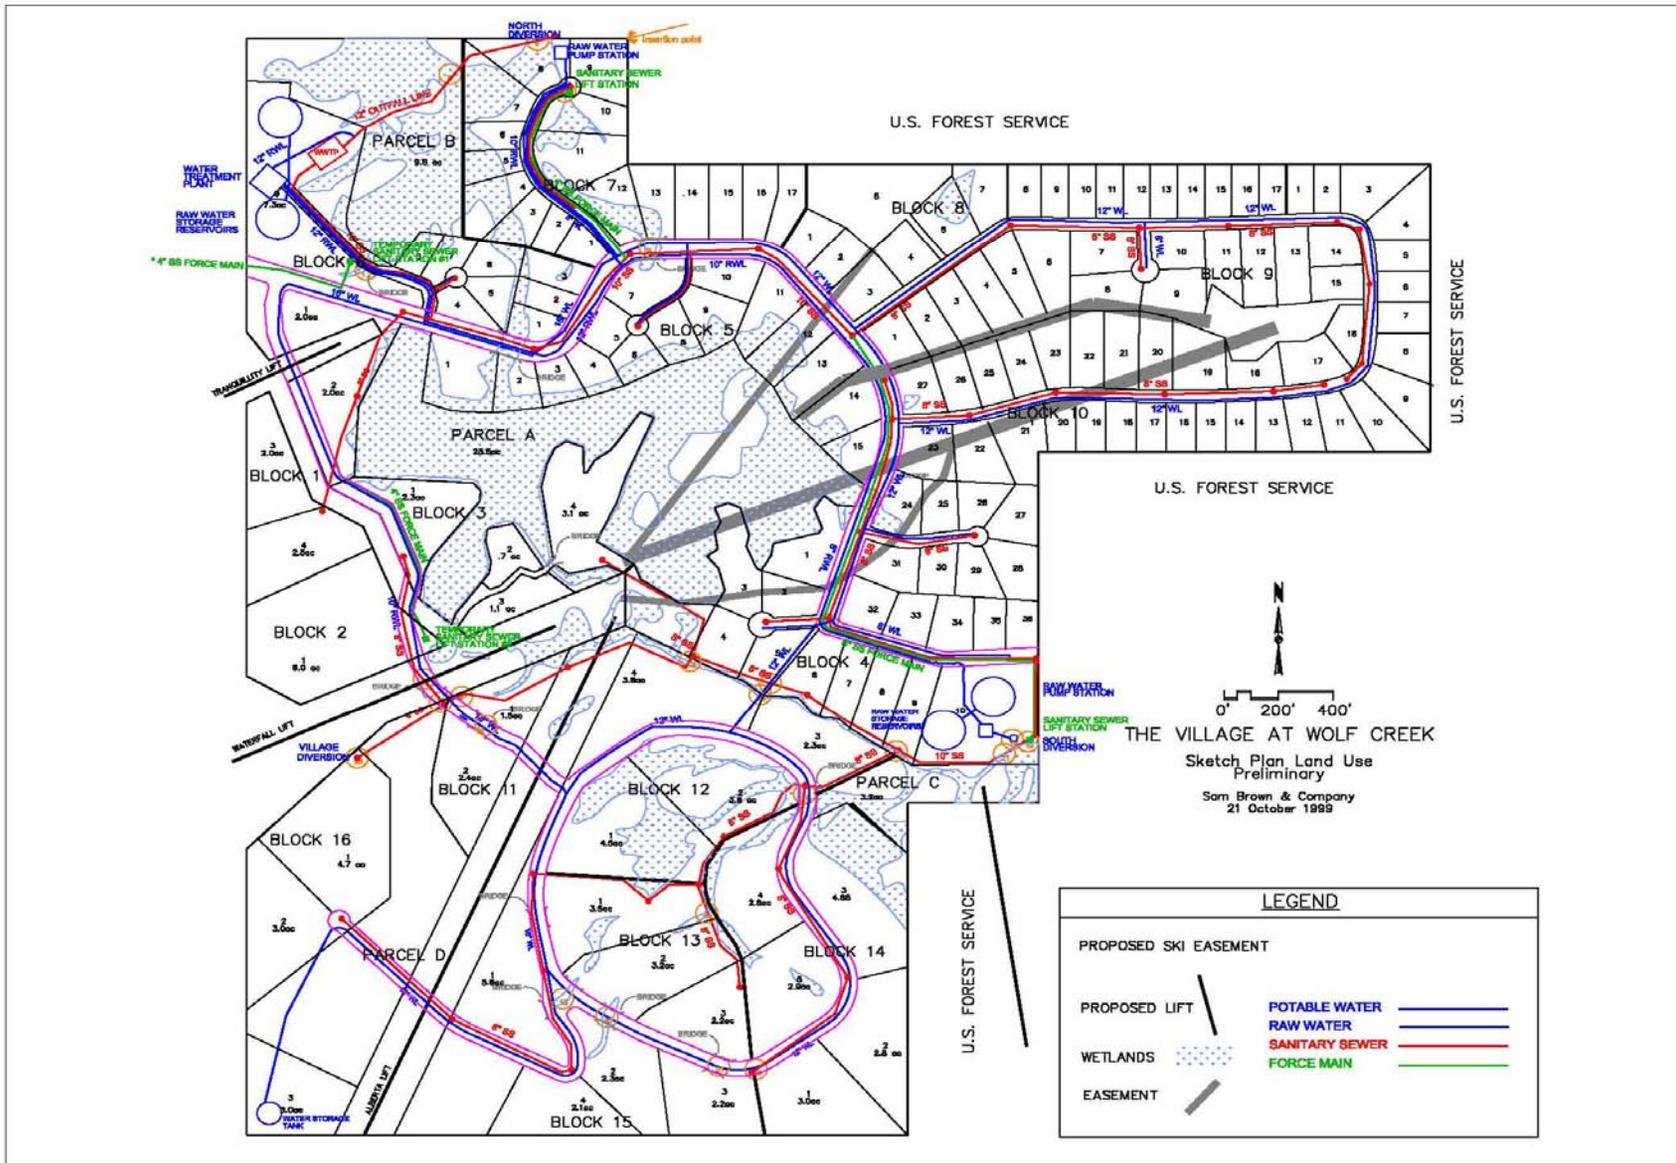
Sketch Plan for the Village at Wolf Creek.
